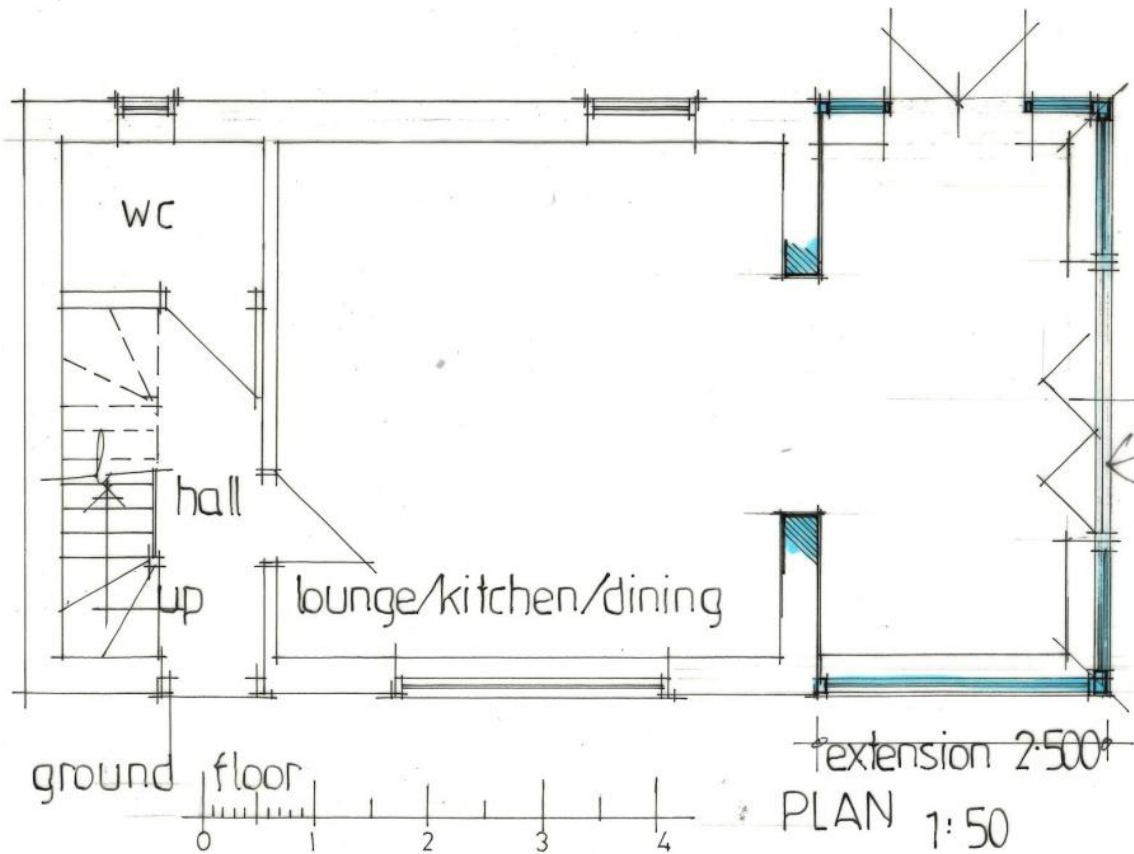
PROPOSED FLOORPLANS (COURTESY OF DRAWING SERVICES LTD)
